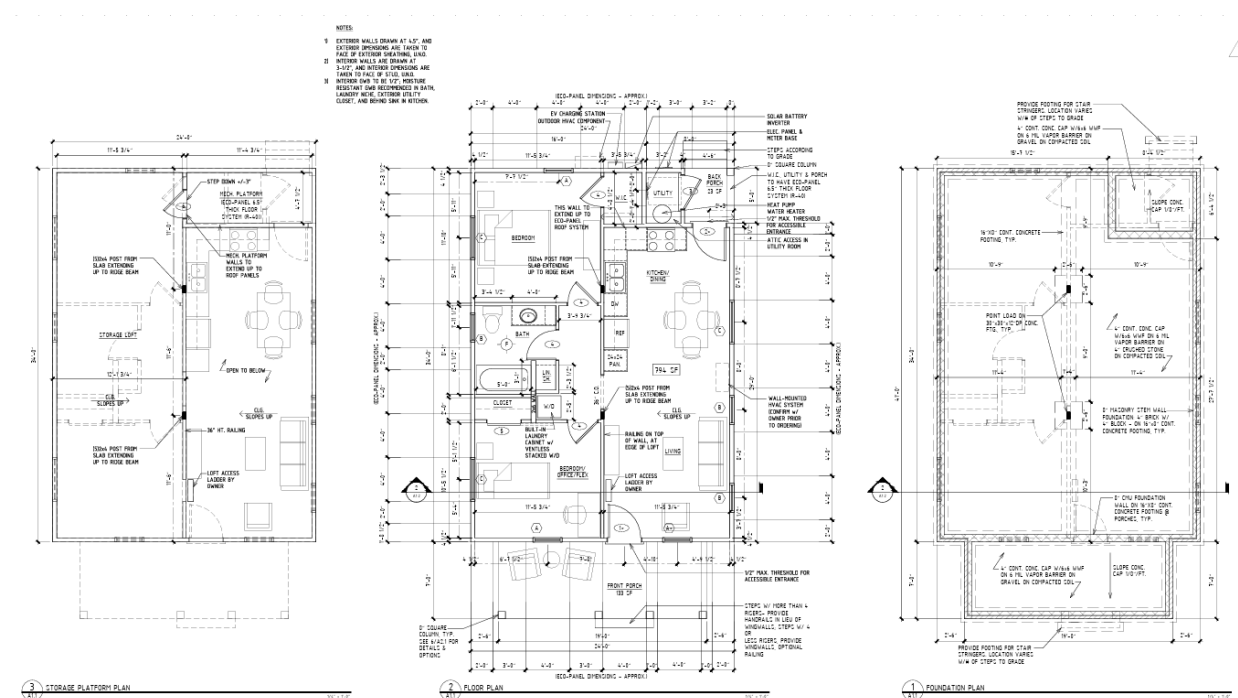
Howard Building Science single-family production home STCBT pilot test – floor plans
